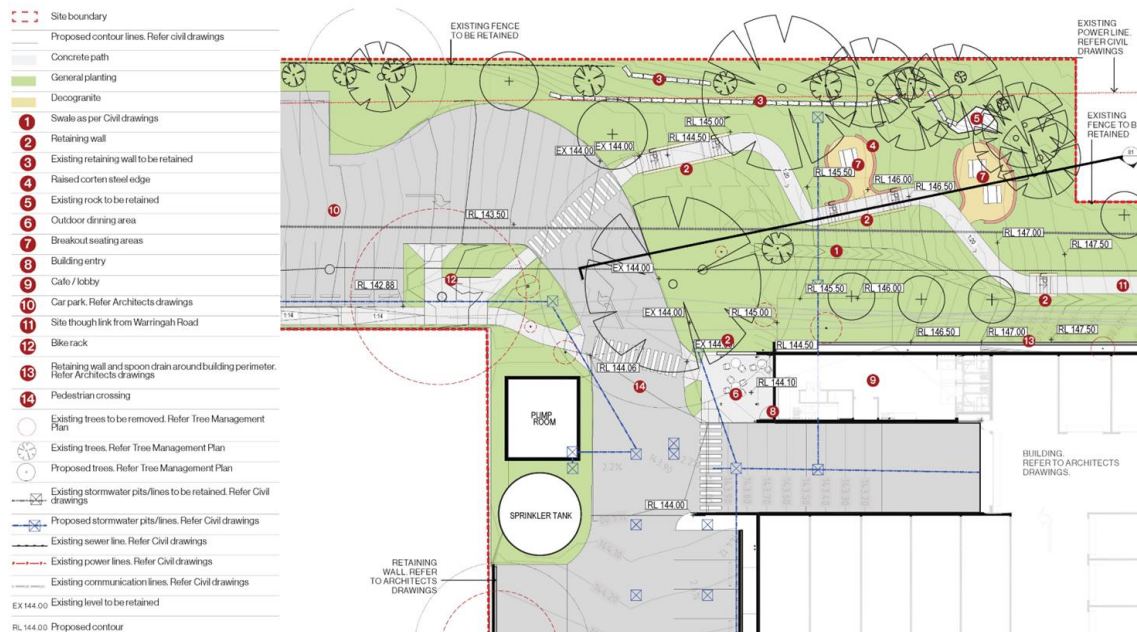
Ground floor landscaping scheme showing breakout space adjacent to main entry lobby (Source: Place Design Group)
